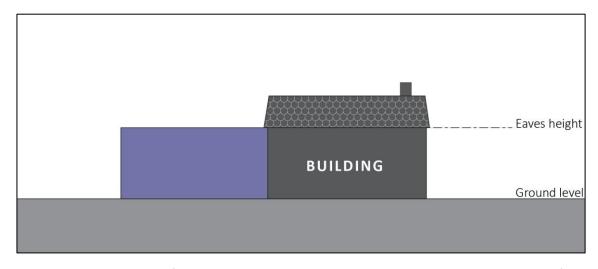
Construction of a single-storey addition or extension to an existing building is exempt if the walls of the addition do not exceed the eave height of the existing single-storey building; note this graphic does not indicate or specify the form of the roof to the addition
